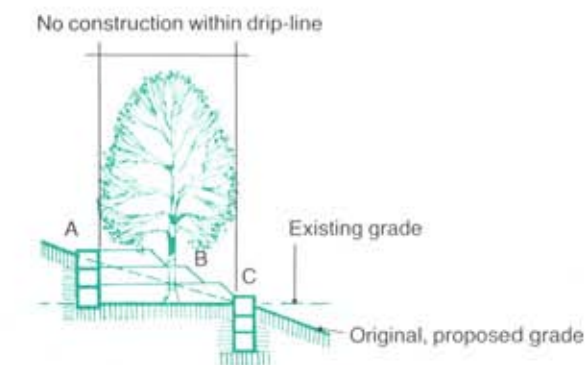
This tree, situated on a slope, was preserved by using a stone and concrete wall.
